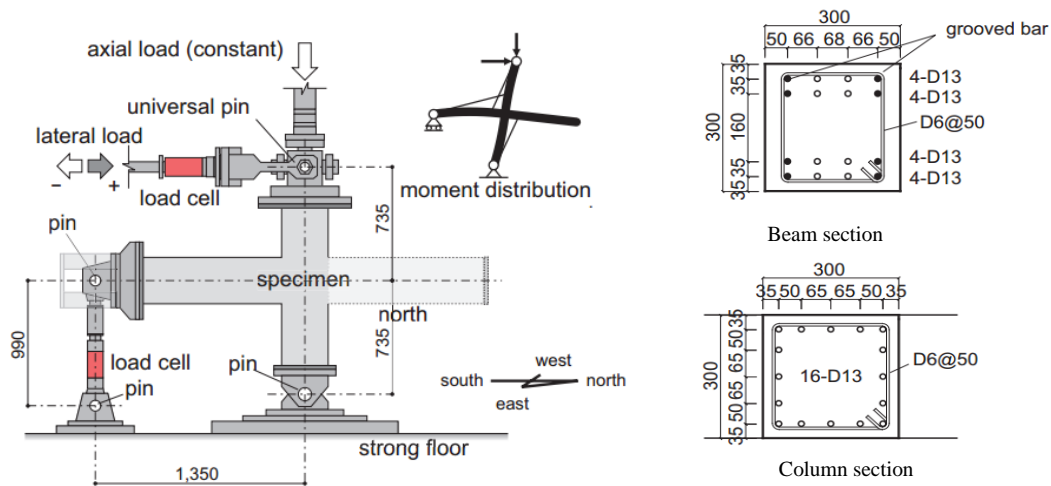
Geometry and reinforcement details of the beam-column joint [39]. All dimensions are in mm.
